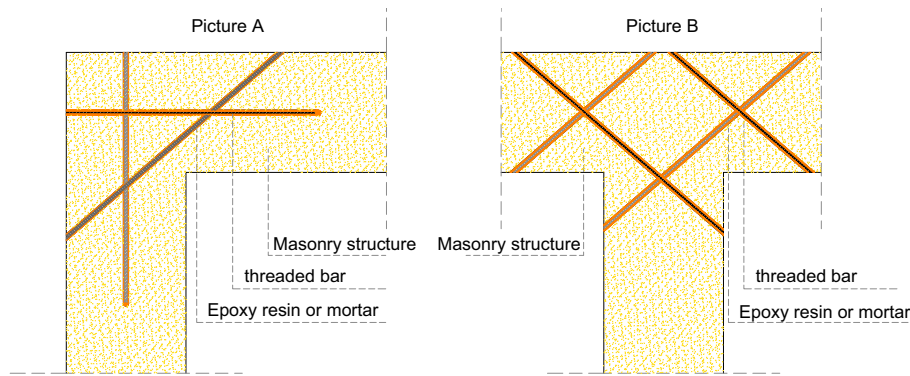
a) Injected anchors for connecting walls at a corner; b) injected anchors for connecting transversal and bearing walls.
